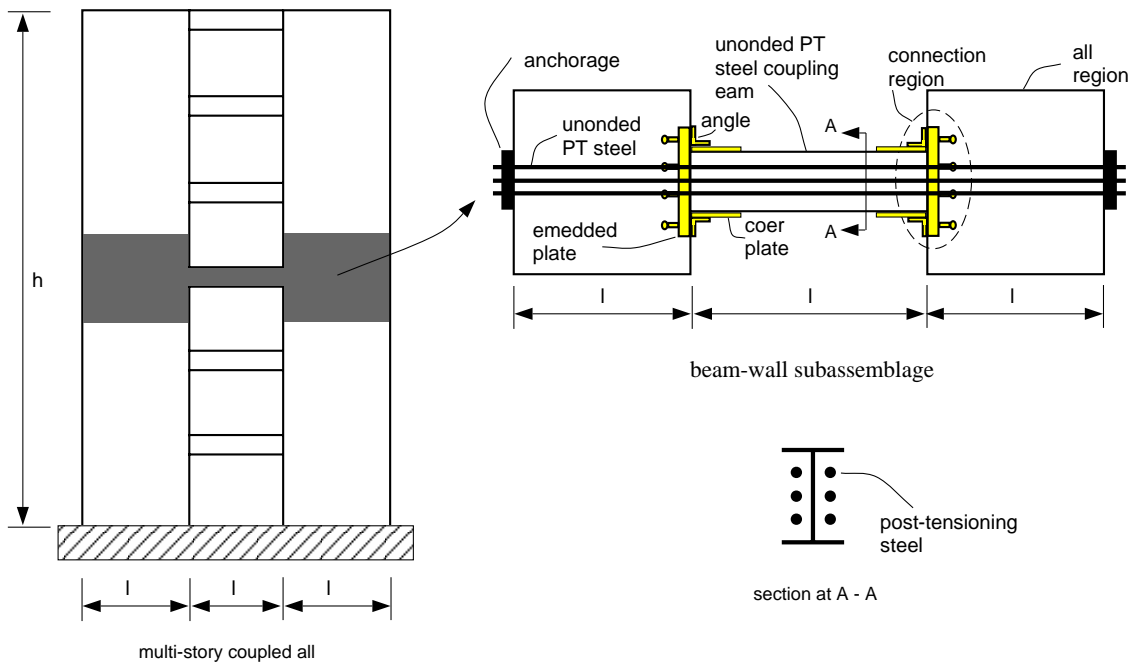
Unbonded Post-Tensioned Wall Coupling Beam
